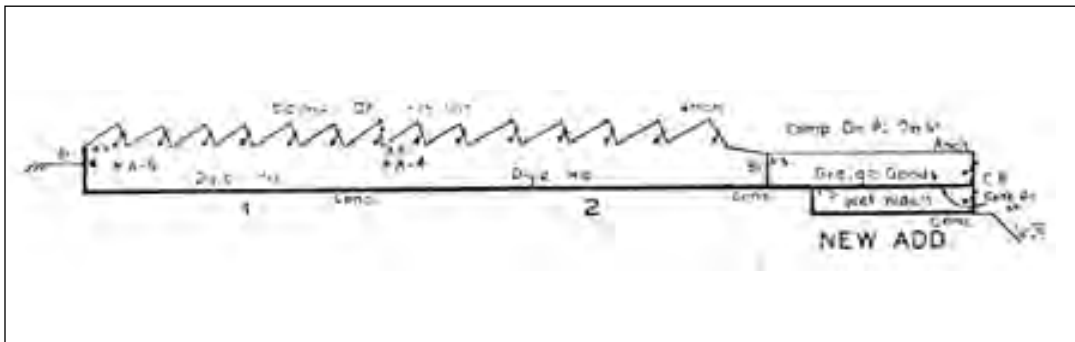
Factory Mutual Insurance Co. *Mill Realty Co.* 1965. South-north cross-section through Buildings 1, 2 and New Addition. Scale: 1 inch= 30 feet (approximately).
